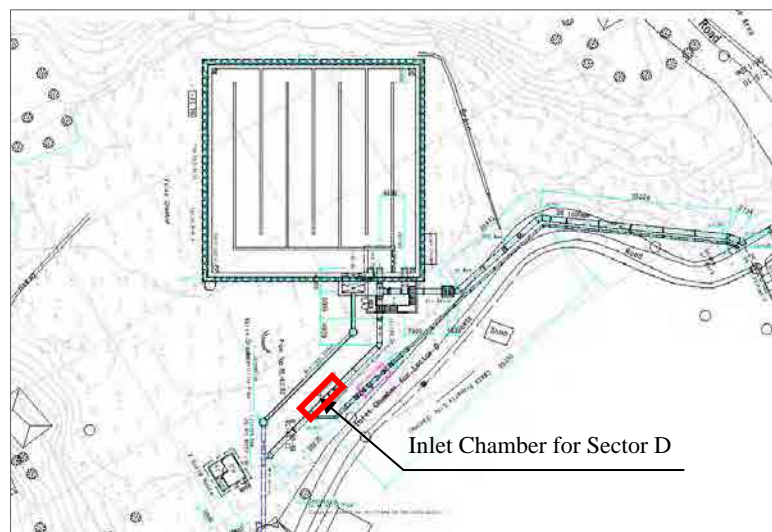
General Layout Plan of Battali Hill Reservoir
